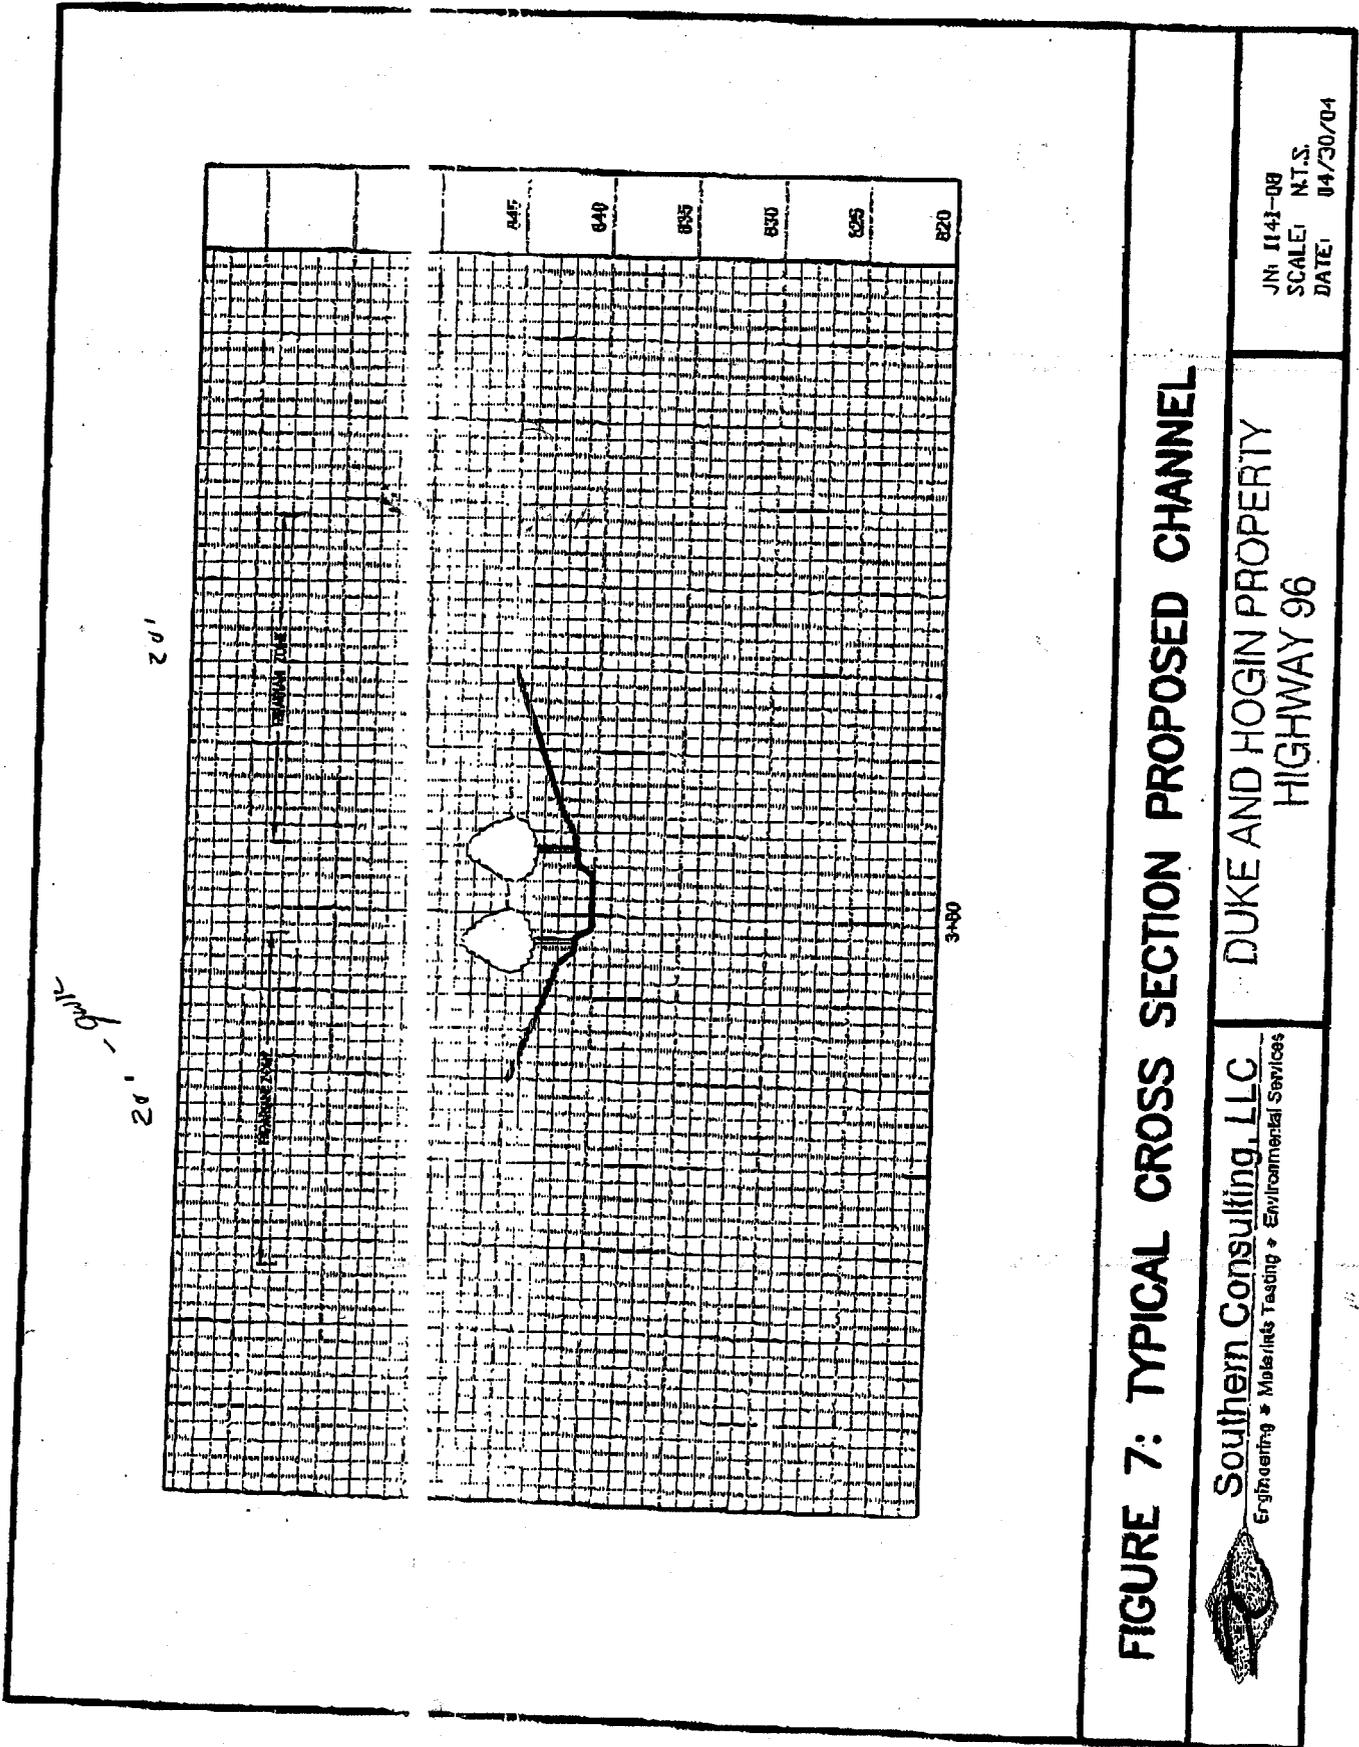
TYPICAL CROSS SECTION PROPOSED CHANNEL
